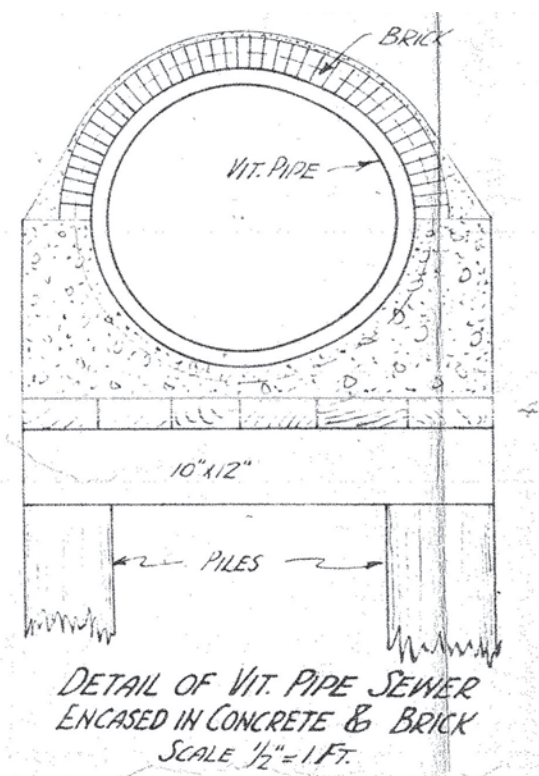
Detail of brick sewer in Newark St. from Park Ave. to Harrison St., Whittemore 1940.
